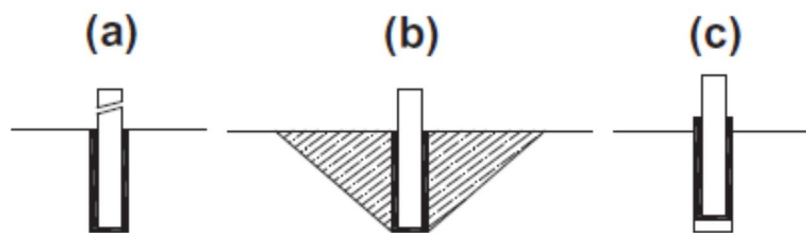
Separated failure modes used in design methods: (a) tensile failure of the steel anchor bolt, (b) full concrete failure, and (c) bond failure: extraction of the steel bolt from the concrete [11].
